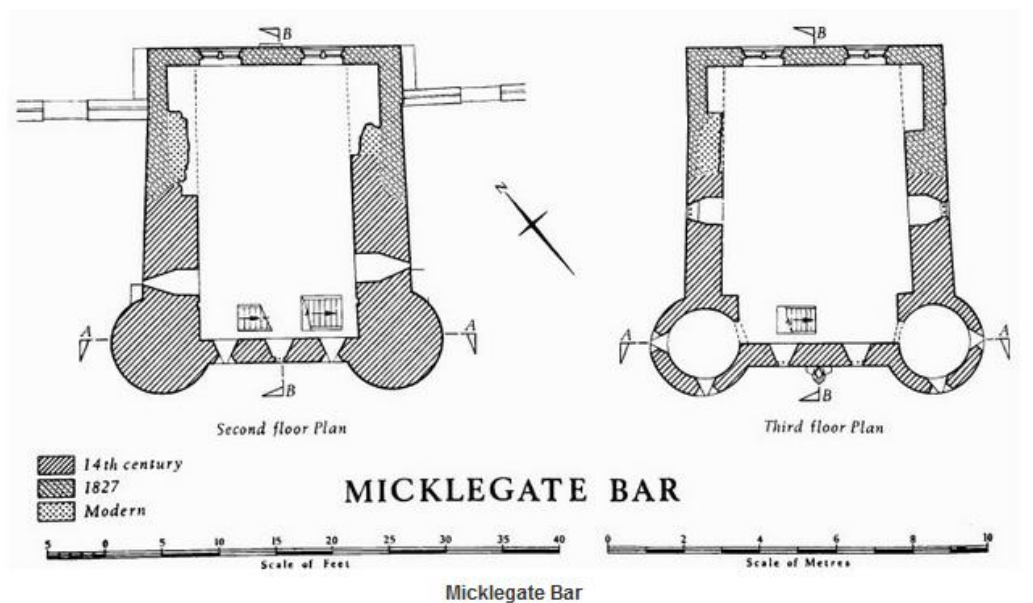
Floor plans of the second and third floor (RCHME 1972)
